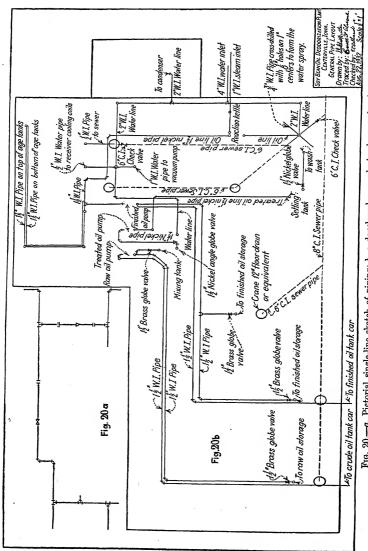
a, Pictorial single-line sketch of piping; b, a developed general pipe-layout sketch.
